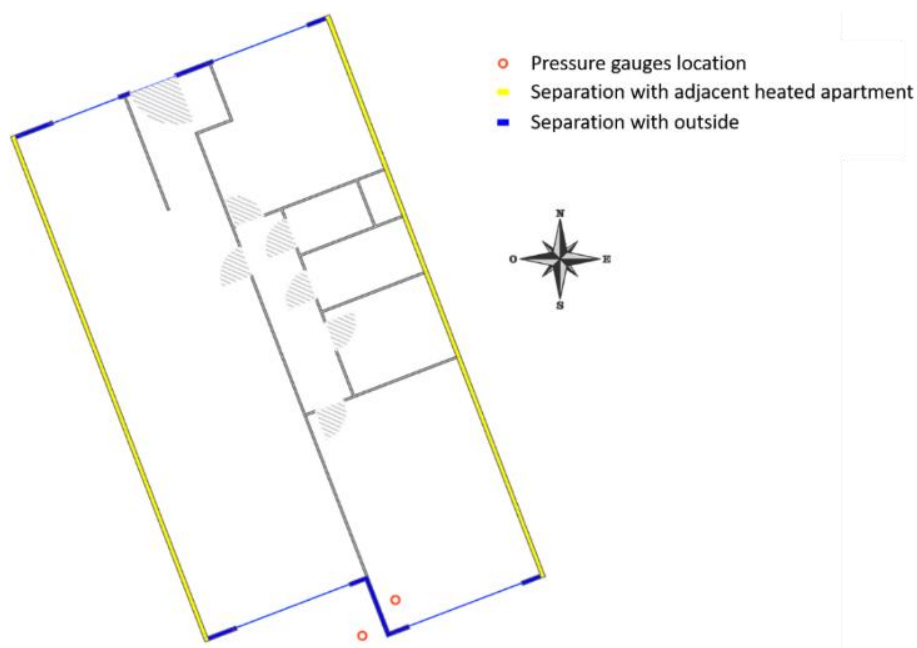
Schematic plan of the tested apartment, including separation type (with adjacent heated apartment or with outside) and pressure gauges location
